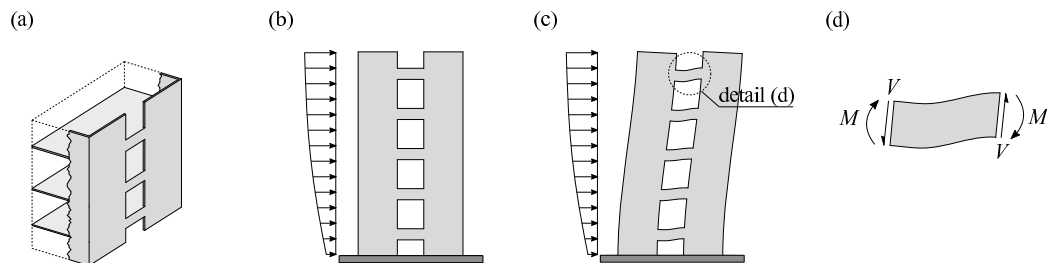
Coupling beams in reinforced concrete cores: (a) view of a core with openings; (b) core subjected to horizontal loading; (c) deformation of the core; and (d) internal forces developing in a coupling beam
